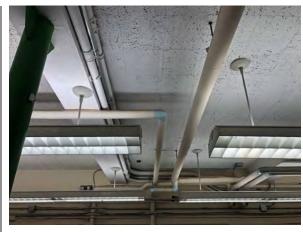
Piping and wiring below applied acoustical ceiling tile in Room 015.
